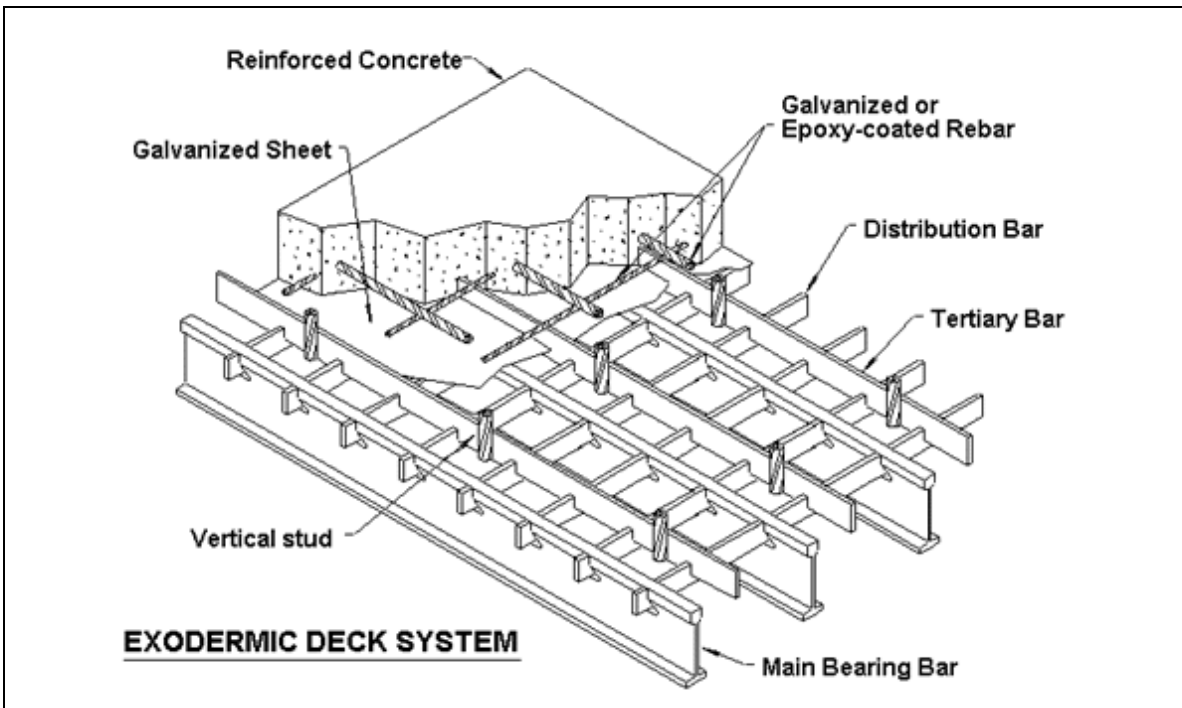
Exodermic Deck System original design (Exodermic Bridge Deck, Inc., 1998)
